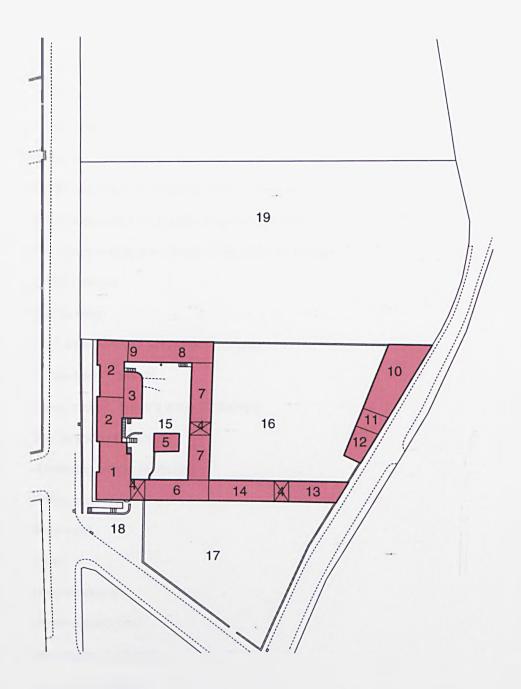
Hypothetical plan of the original Globe works layout c.1825. Scale 1:1000 (author).
